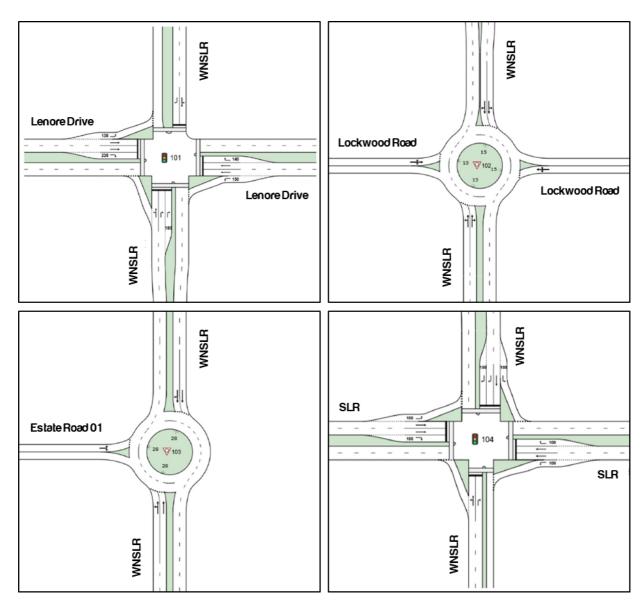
WNSLR Proposed Intersection Arrangement Concepts
